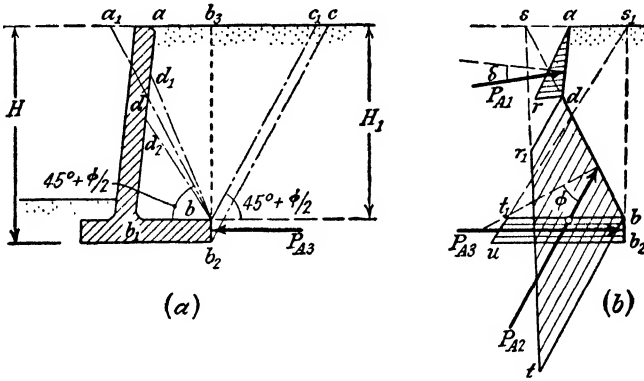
Earth pressure of sand on cantilever retaining wall.
